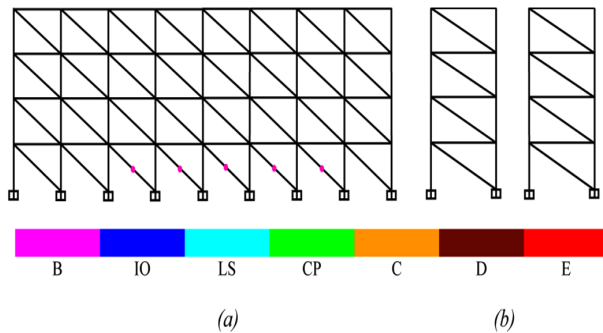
Yield pattern under gravity load for four storey uniformly infilled SMRF building when construction sequence is considered in analysis: (a) typical longitudinal frame; (b) typical transverse frame
